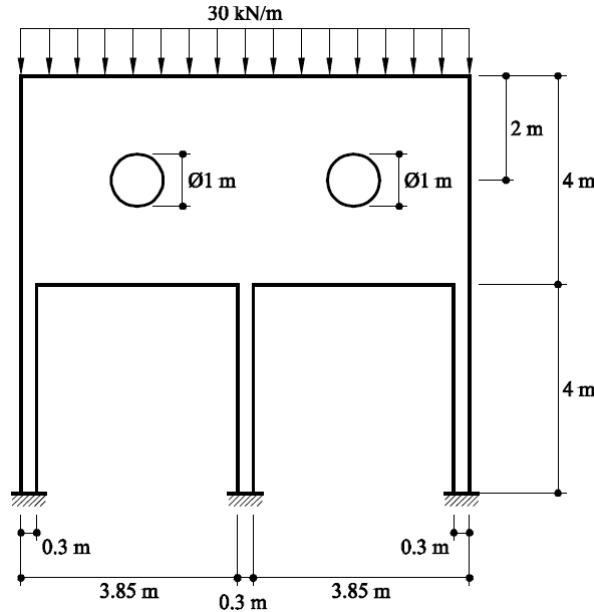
Reinforced concrete plate with two holes: geometry and loads applied.
